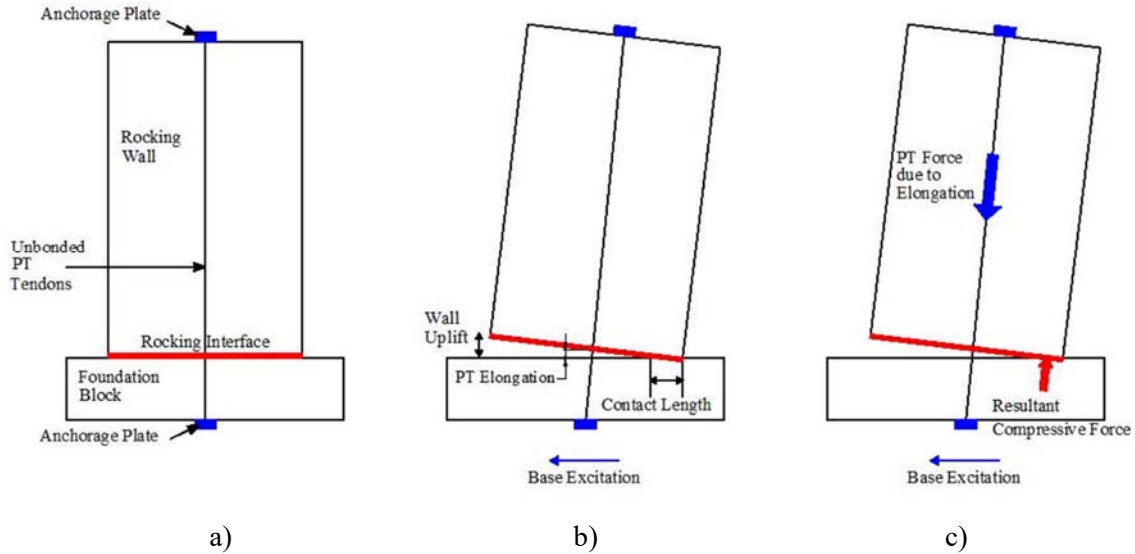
(a) Precast concrete wall with unbonded PT (b) wall uplift due to base excitation, and (c) moment resisting mechanism during rocking
